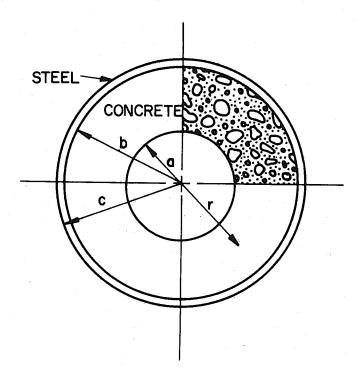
CROSS - SECTION OF THE COM-POSITE COLUMN
